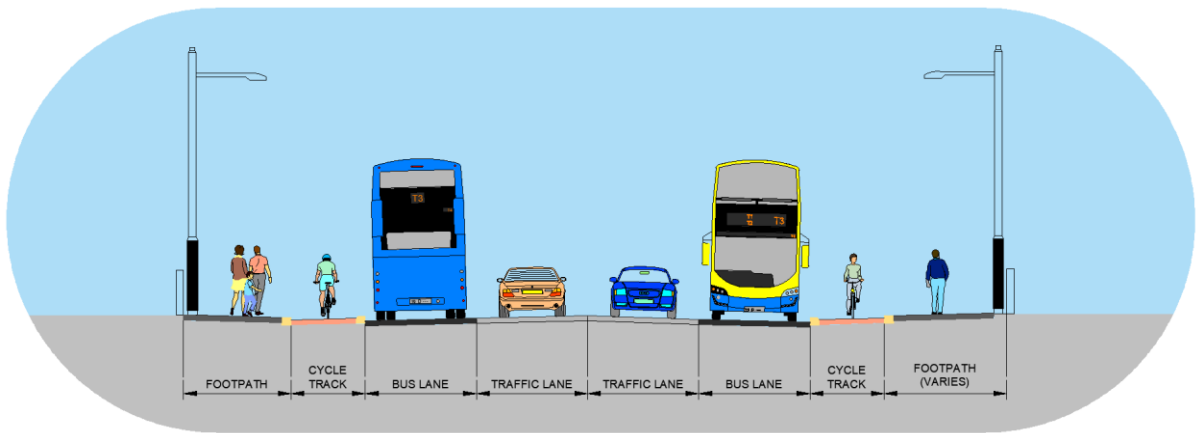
Typical CBC Cross Section St. Luke's Avenue
